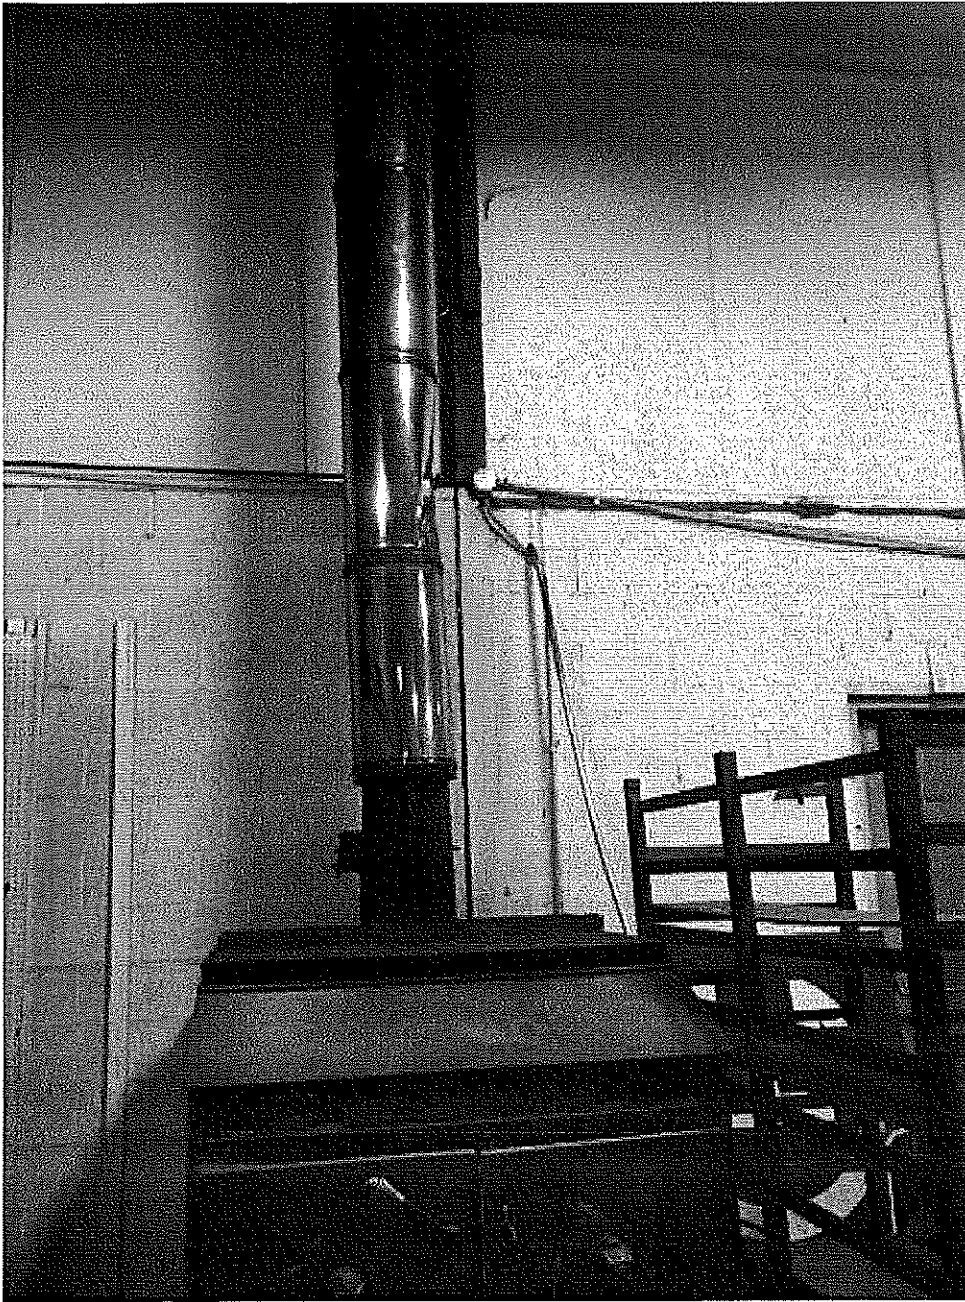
(Pallet burner #2) : Pallet burning stove, not currently in use.
